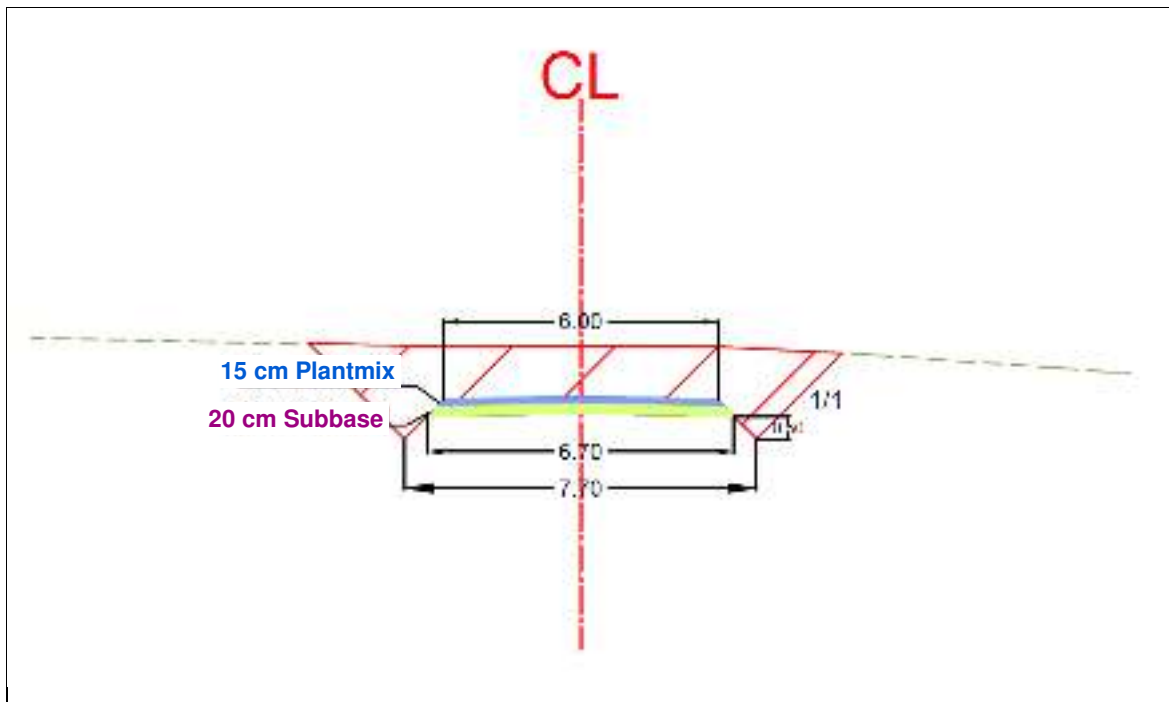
Pavement Structure of the Internal Site Access Roads
